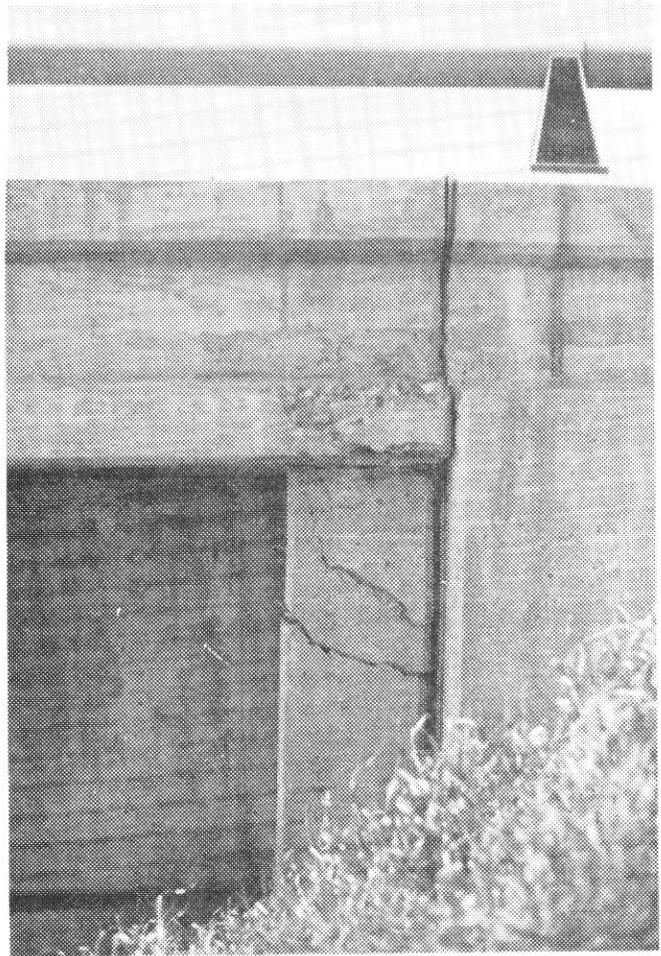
Settlement of concrete curtain wall from bridge girder. Note exposed rebars along separation.
